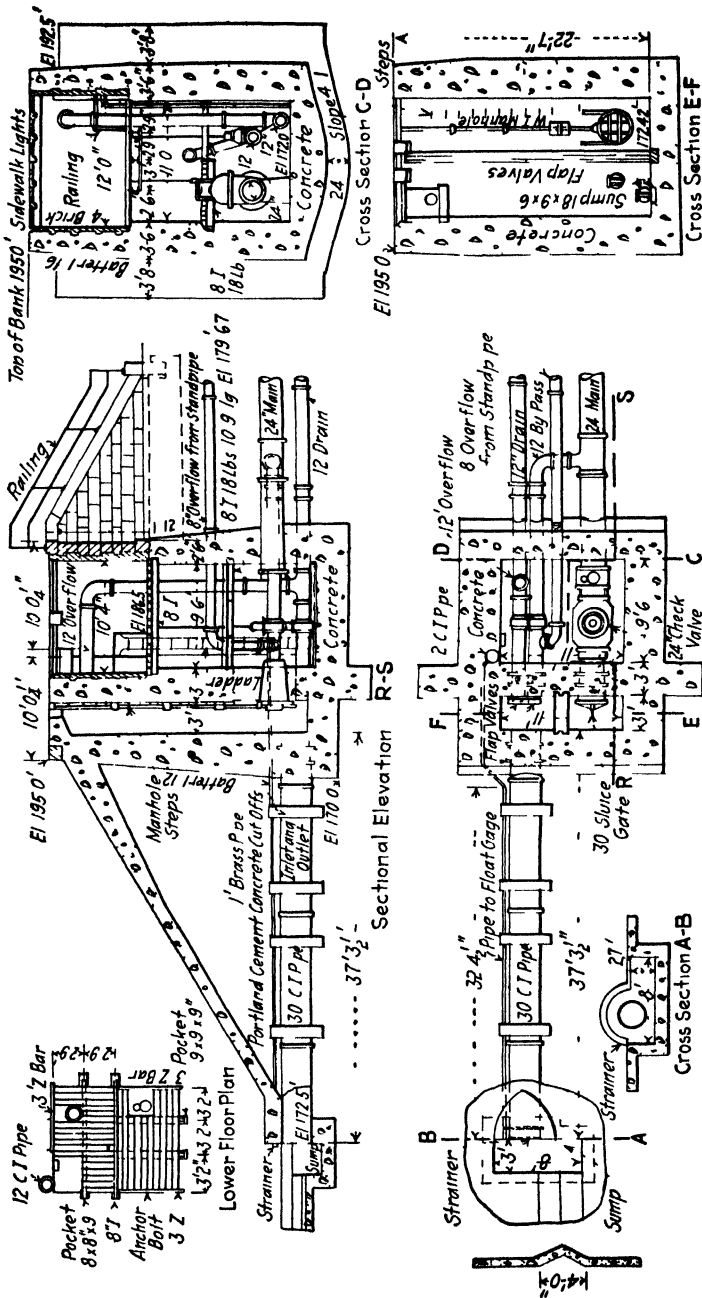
Gate-chamber and pipe connection, Foibles Hill Reservoir, Quincy, Mass¹⁰
